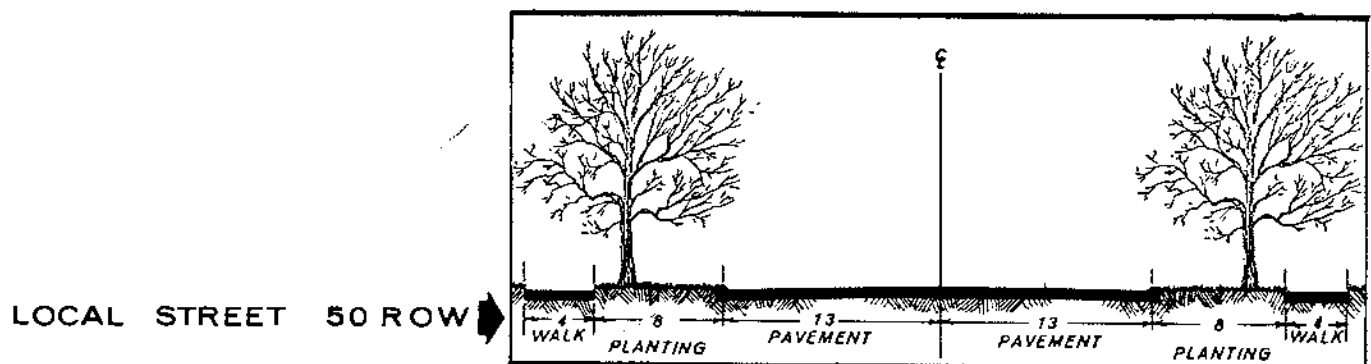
DESIRABLE CROSS-SECTIONS FOR SOUTHWICK CIRCULATION PLAN
